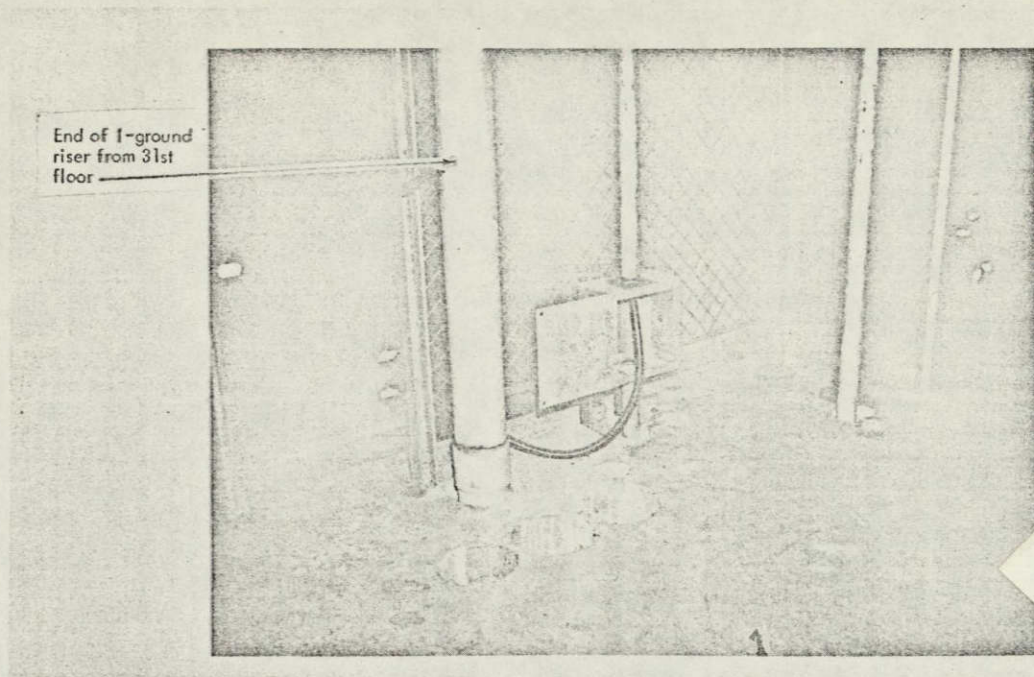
VAB, Tower A, Room 6A3 - Bottom End of I-Ground Riser.
